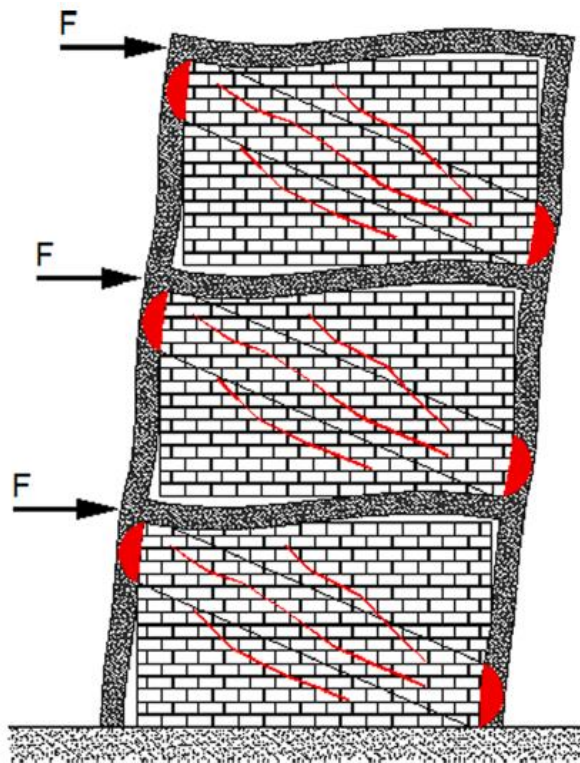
Behaviour of masonry infill walls (Pallares et al., 2021)
